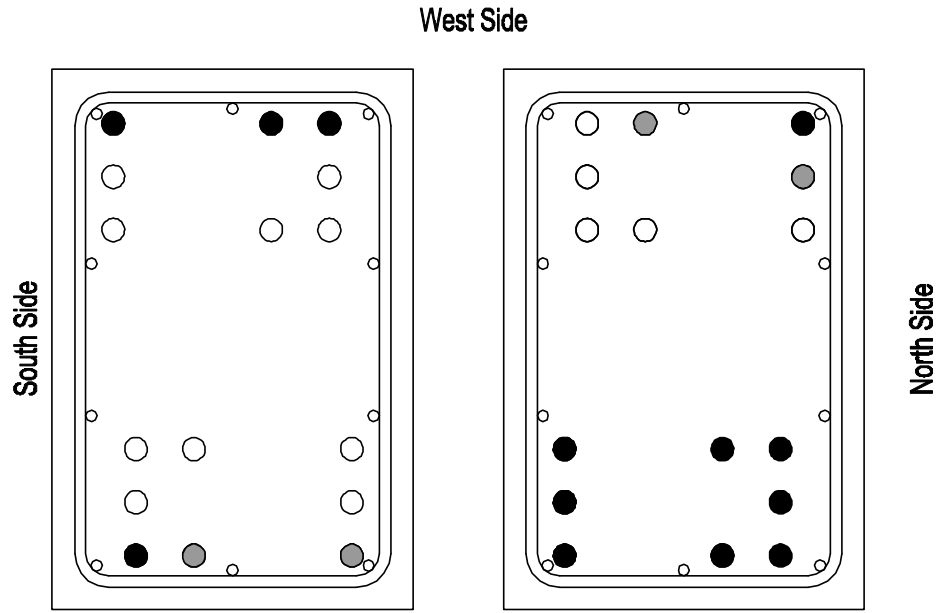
Reinforcing bar fracture locations, D100-3.5
